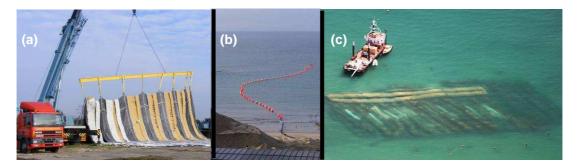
(a) Hoisting a section on to the barge for deployment (b) the sand slurry pipeline (c) the completed lower layer with two of the top layer containers in place.
